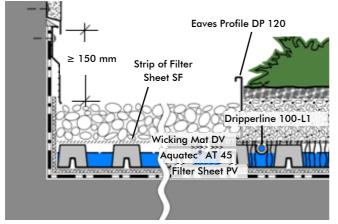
Wall connection with gravel strip and Eaves Profile DP 120; Dripperlines installed parallely to the wall
